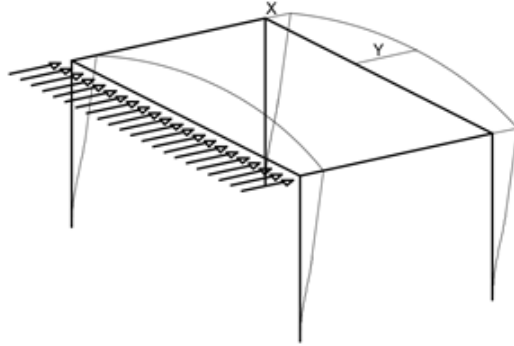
In-plan deformed shape of a simple structure, due to horizontal action
